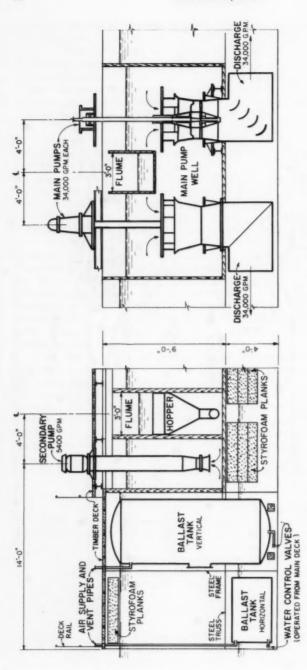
, -GENERAL ARRANGEMENT OF UPPER BAKER FISH COLLECTION BARGE
